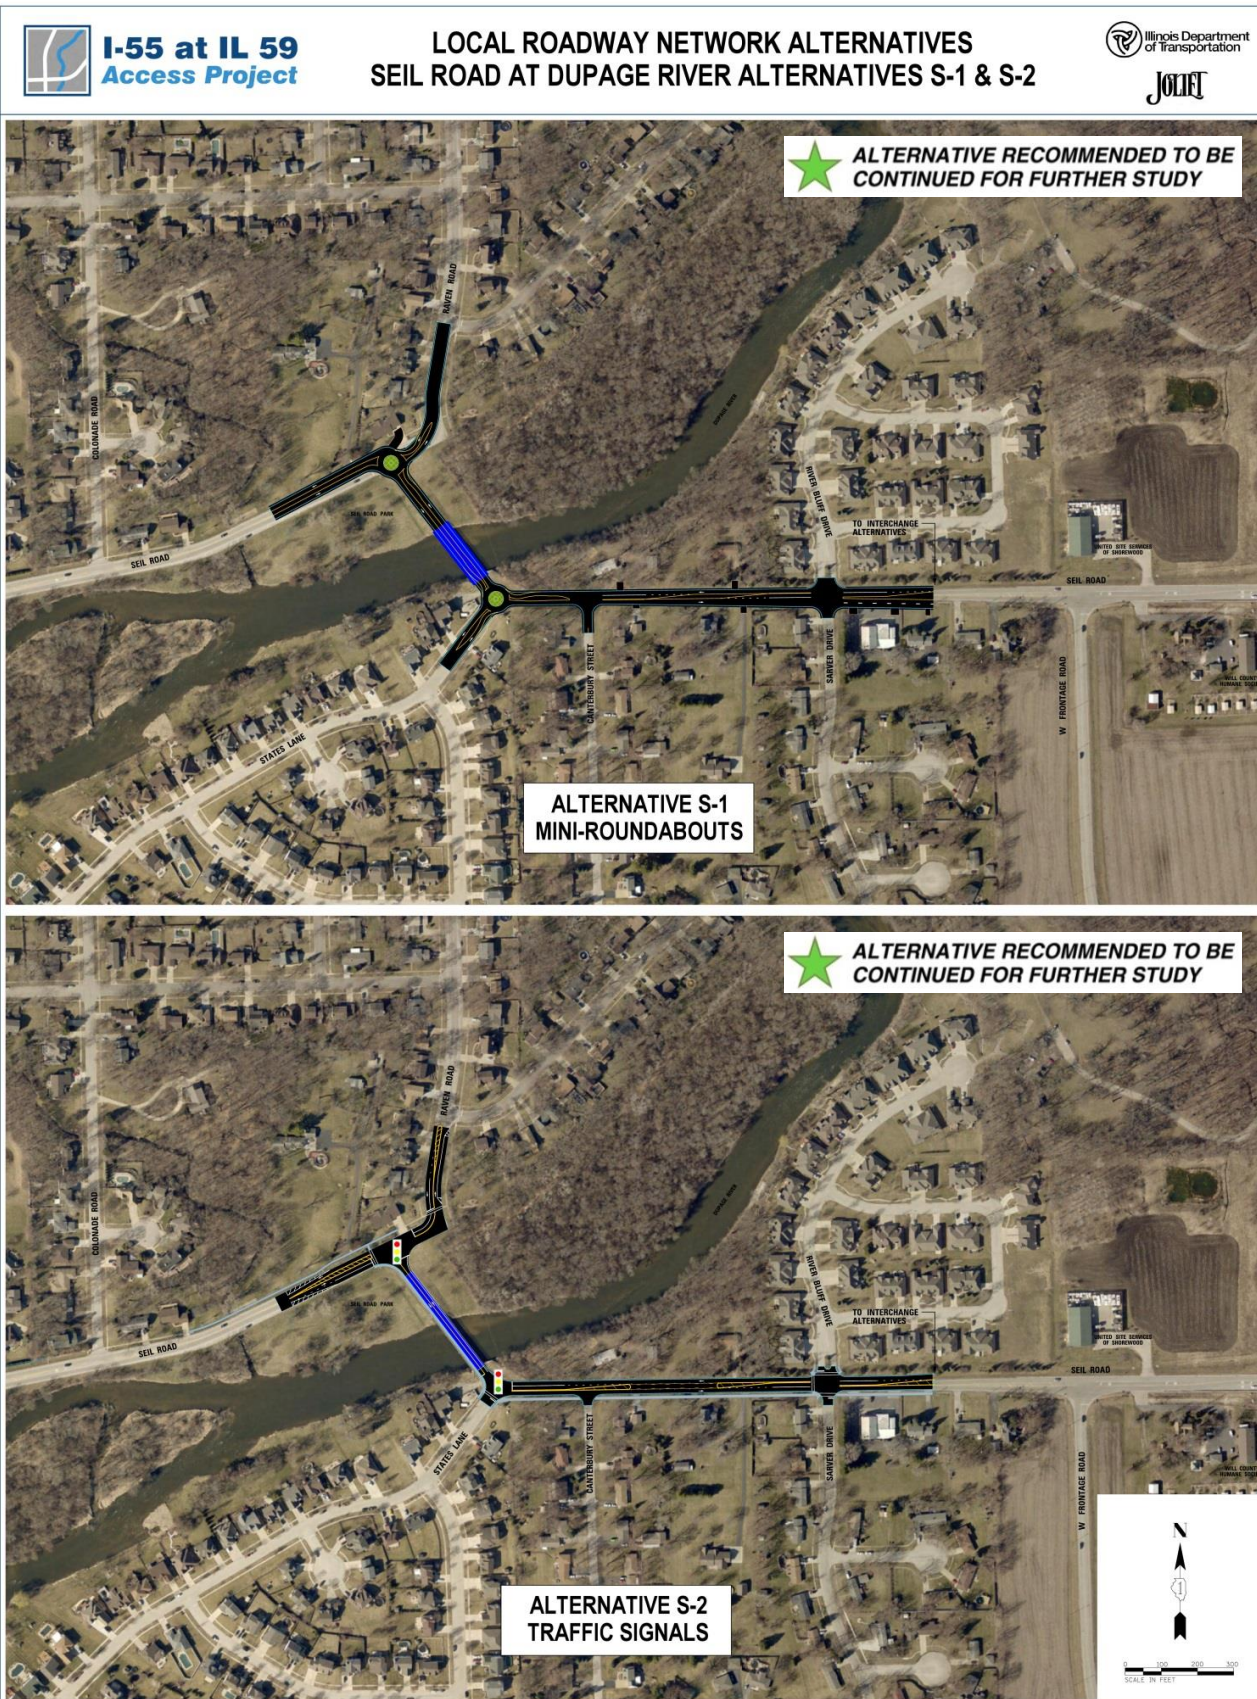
Seil Road Alternatives S-1 and S-2 Concept Plans
